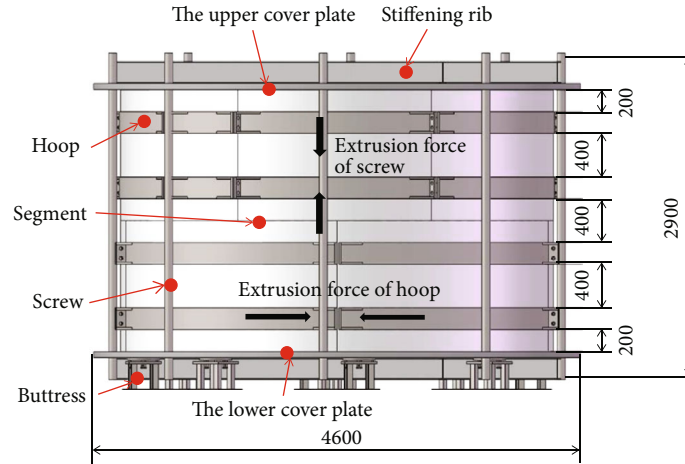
The vertical assembly scheme of double ring segment (unit: mm).
